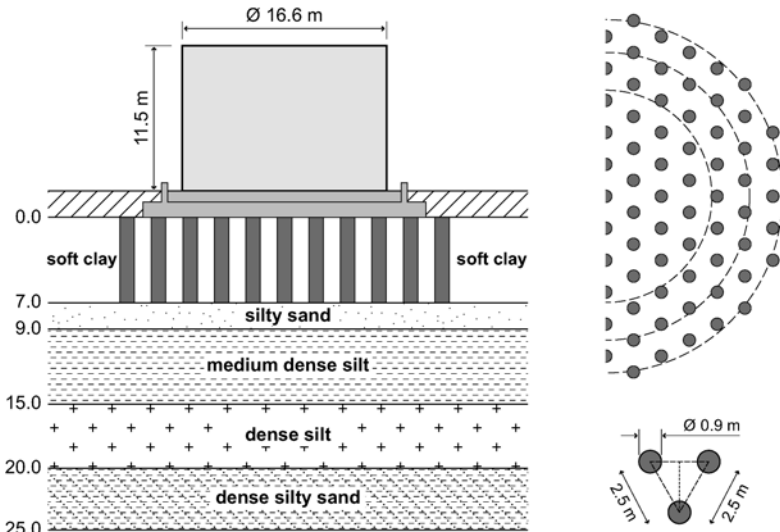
Vibro stone column layout for and cross-section through tank foundation
